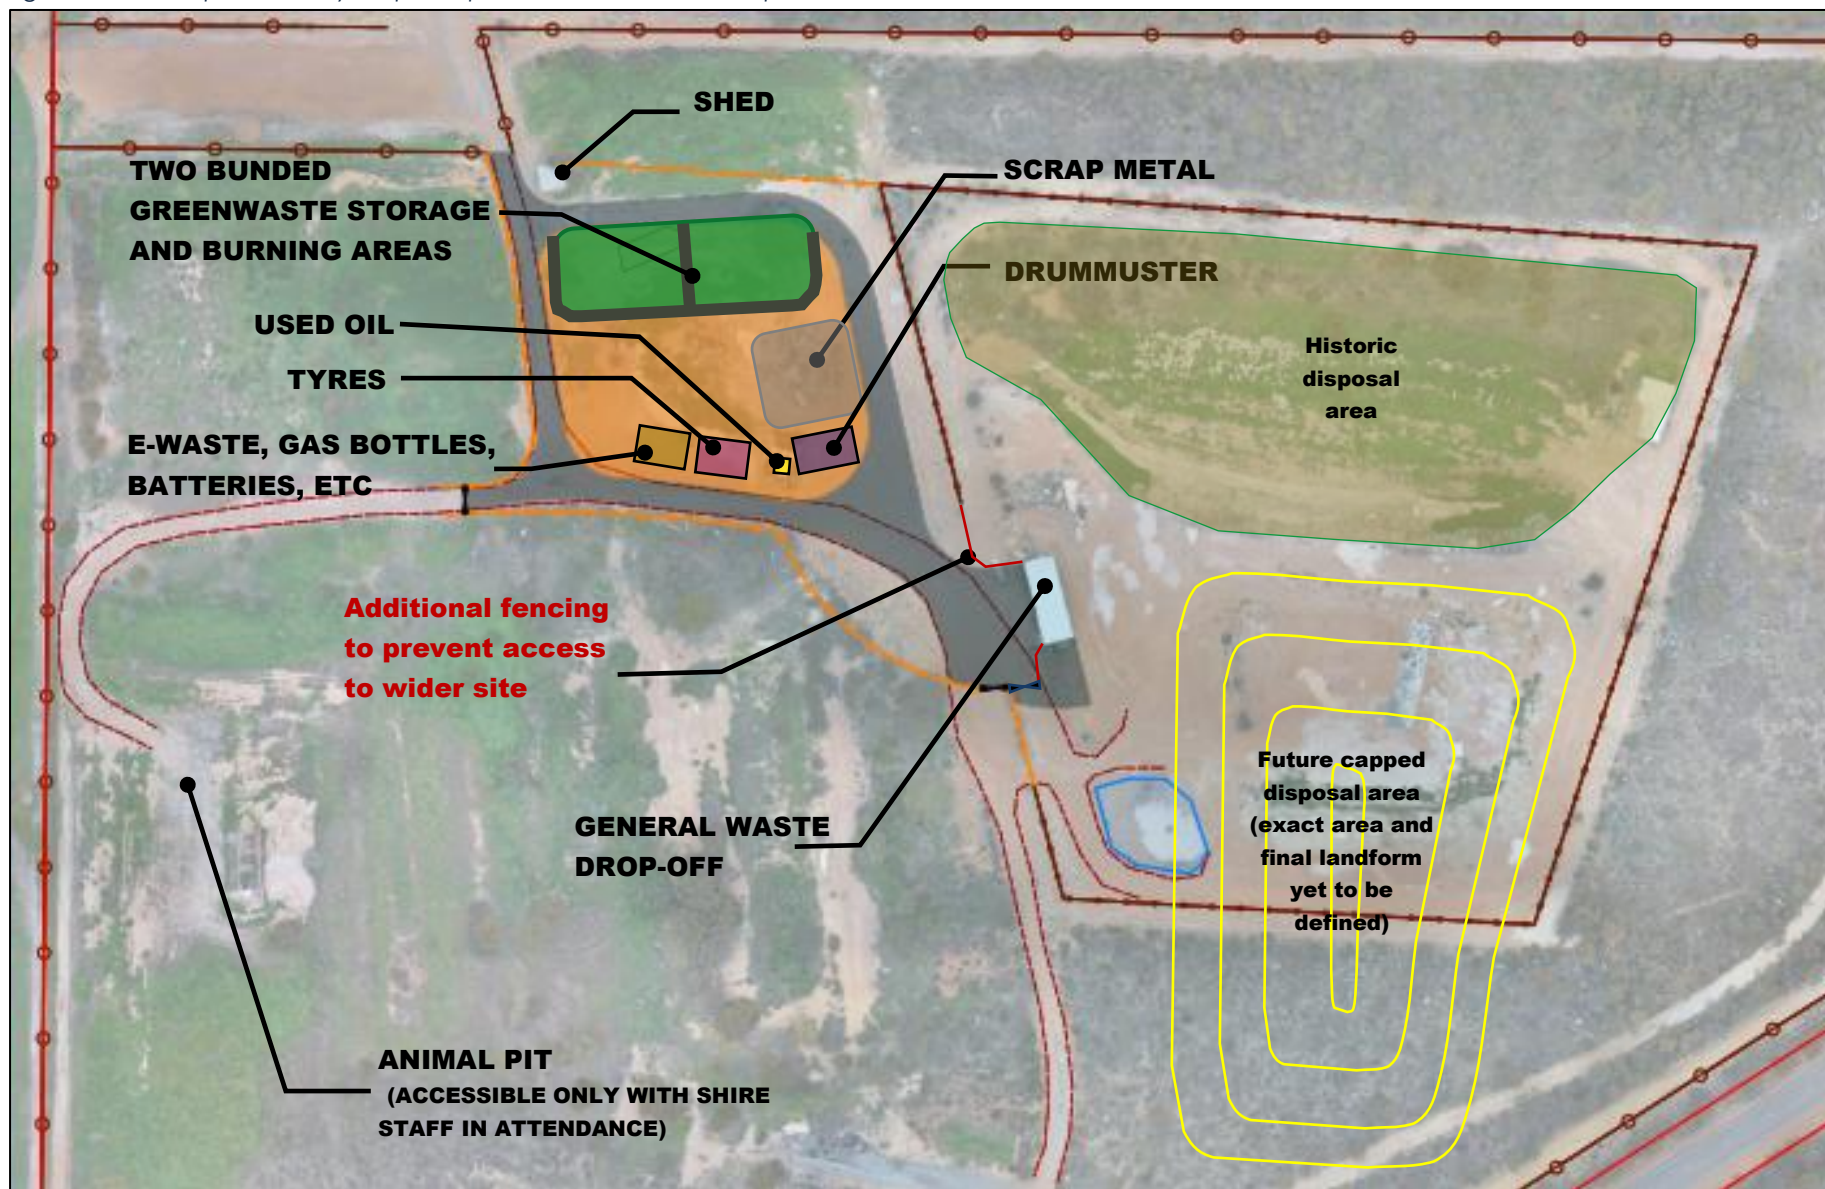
Conceptual site layout plan upon cessation of landfill operations on site
